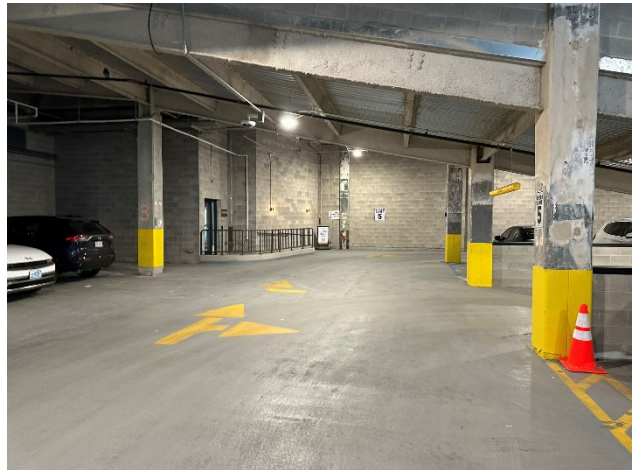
Concrete cover in northeastern portion of basement, looking east.
